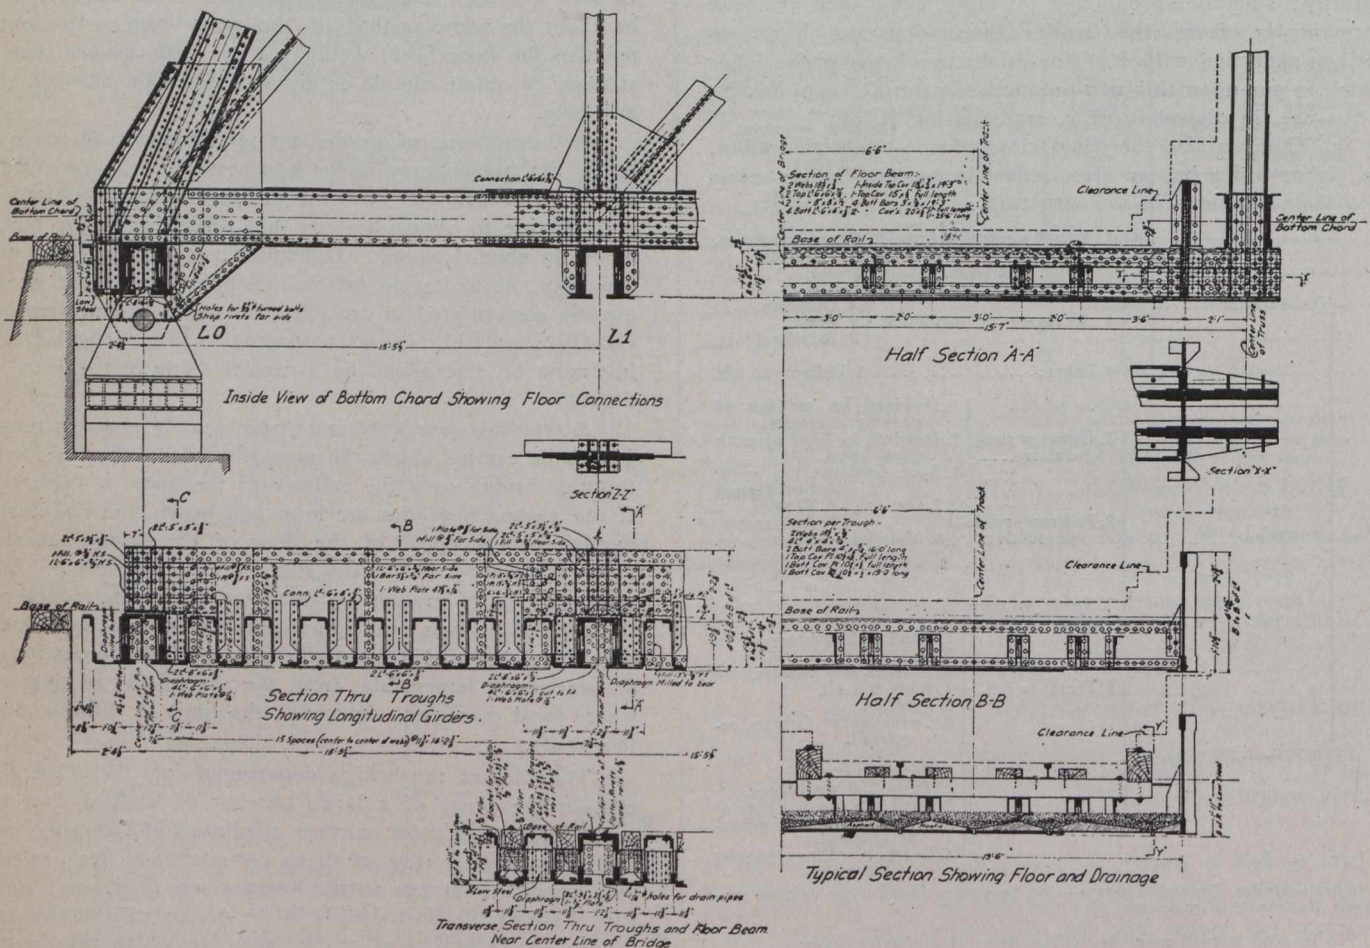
General Details of Shallow Trough Bridge Floor.
